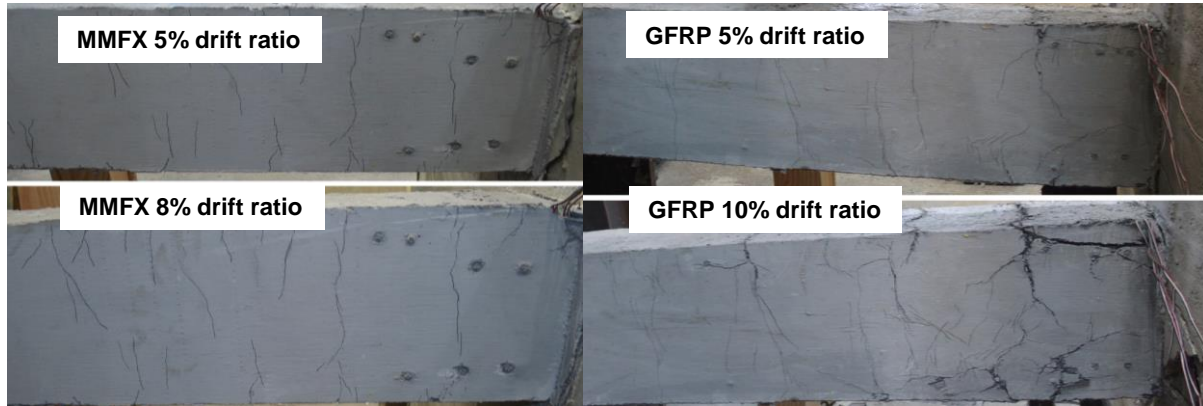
86 Cracking in UHP-FRC #1 and #2 specimens with high-strength steel (left) and GFRP bars (right)
